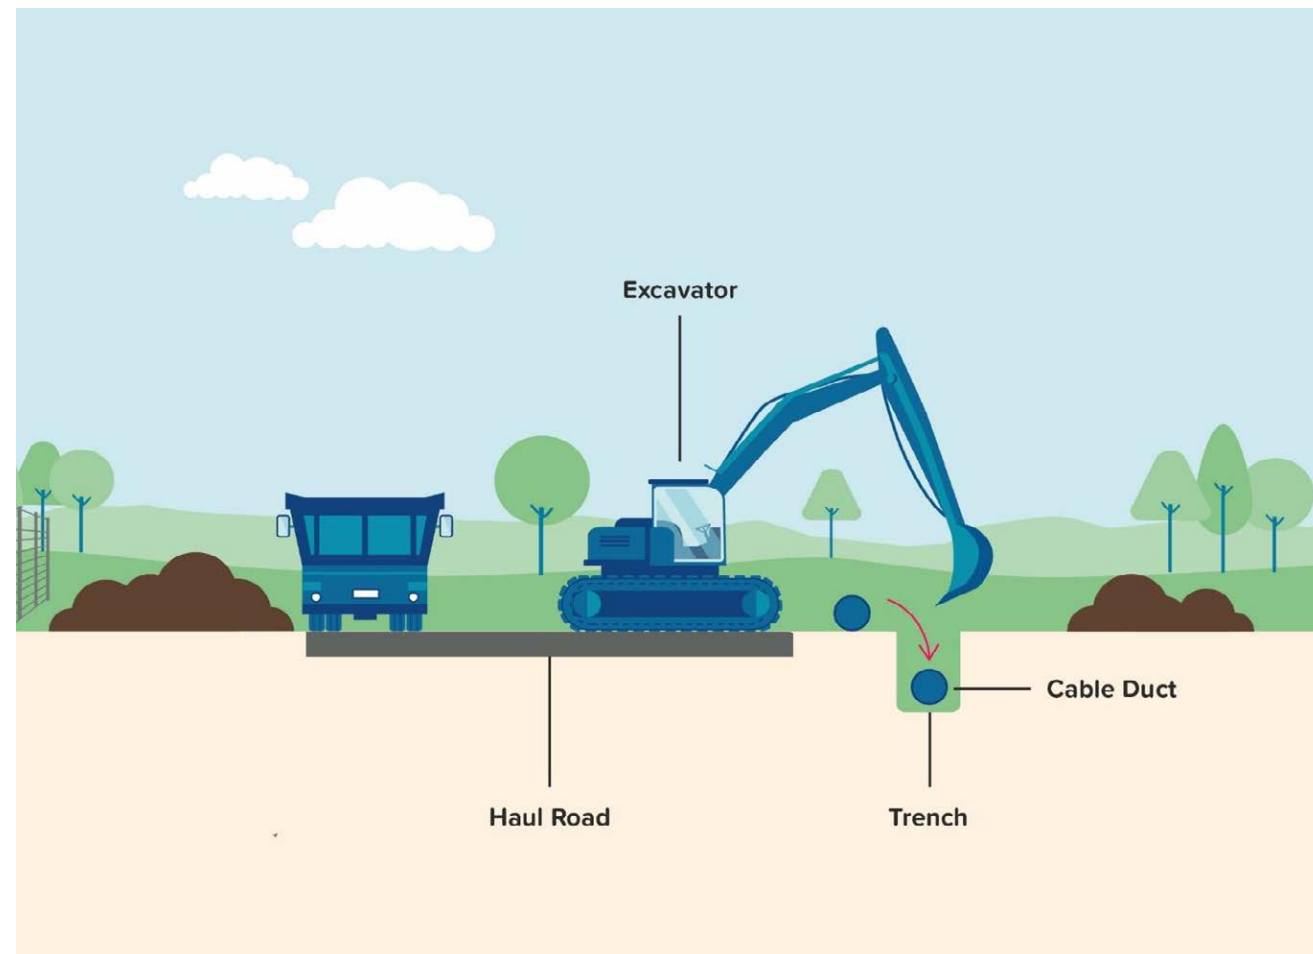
Indicative Cross-Section of Open Cut Trenching Duct Installation
